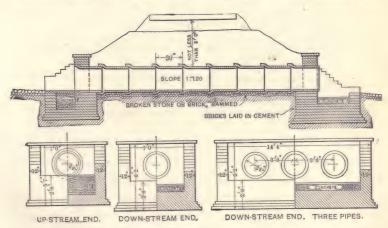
Standard Vitrified-pipe Culvert. Plant System. (1891.)
